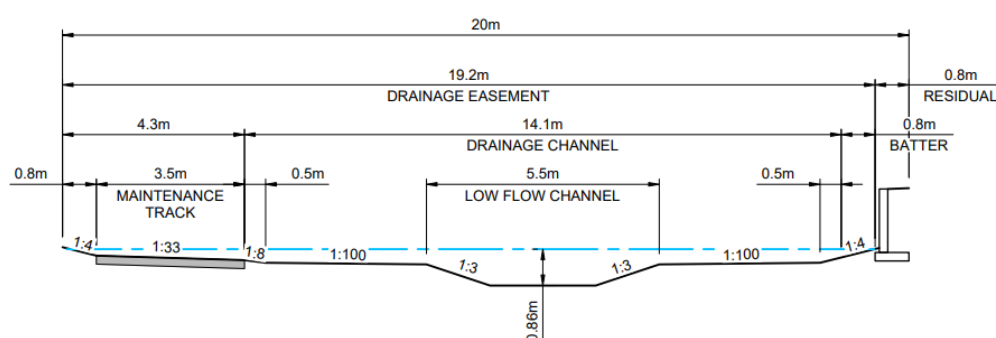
Typical Channel Cross Sections (Upstream of OSD Outlet)
